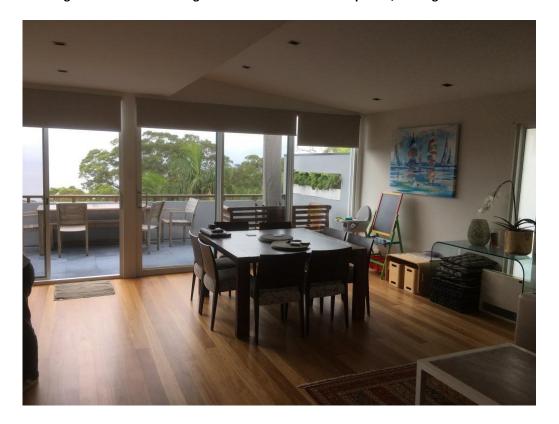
View of the existing rear deck to be replaced, looking from the dining area towards the rear boundary.
